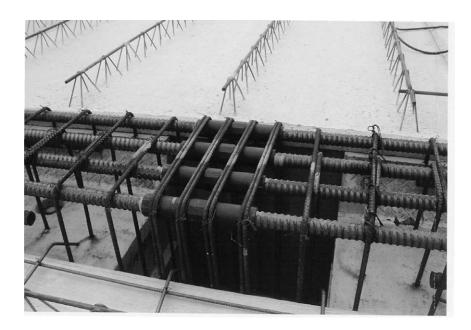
Example of a connection through mechanical couplers in a building in Japan (Courtesy of F. Watanabe)
